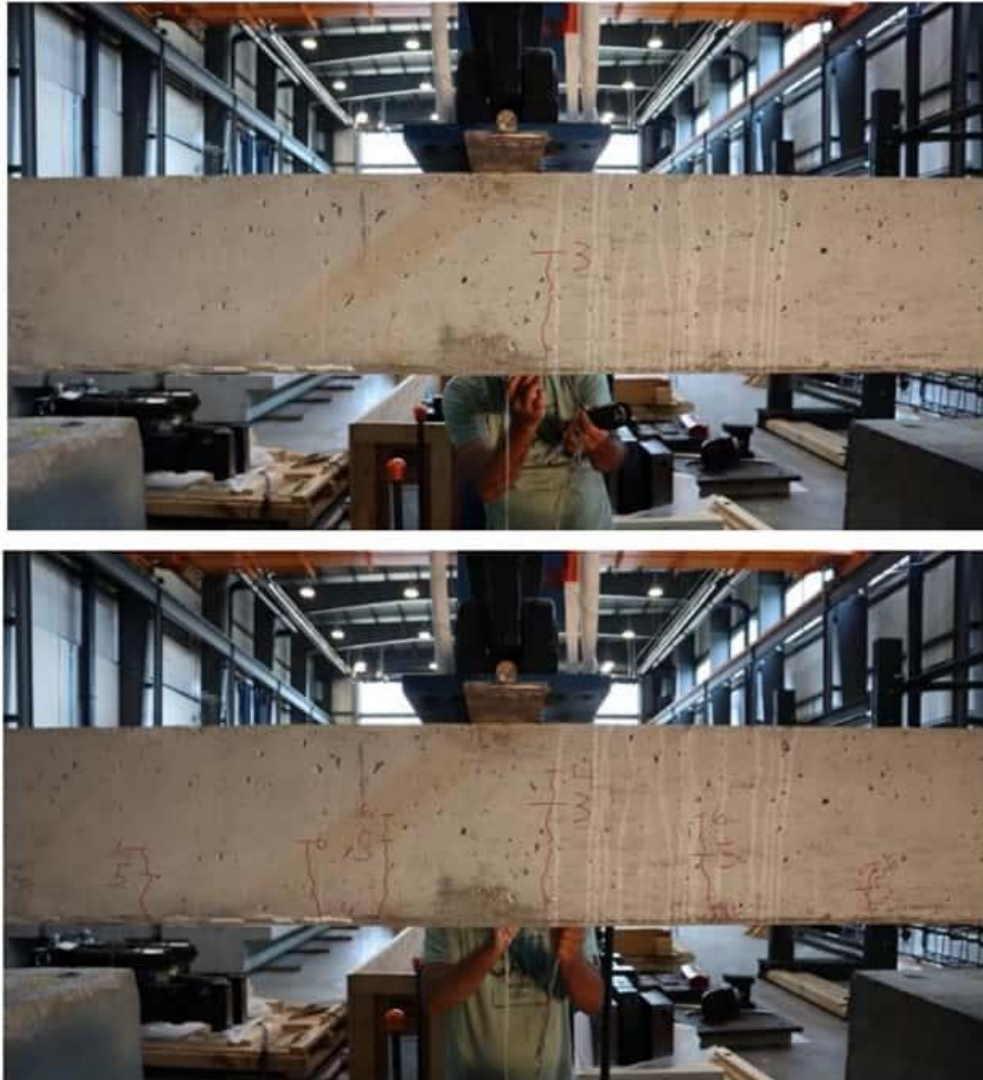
Crack initiation during pre-cracking (Top) and typical crack pattern at end of pre-cracking (Bottom)
